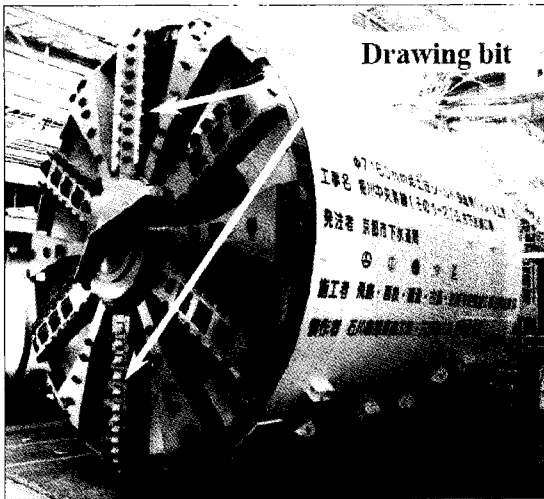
$\phi 7,160\text{mm}$ EPB shield machine Kyoto city sewerage project
